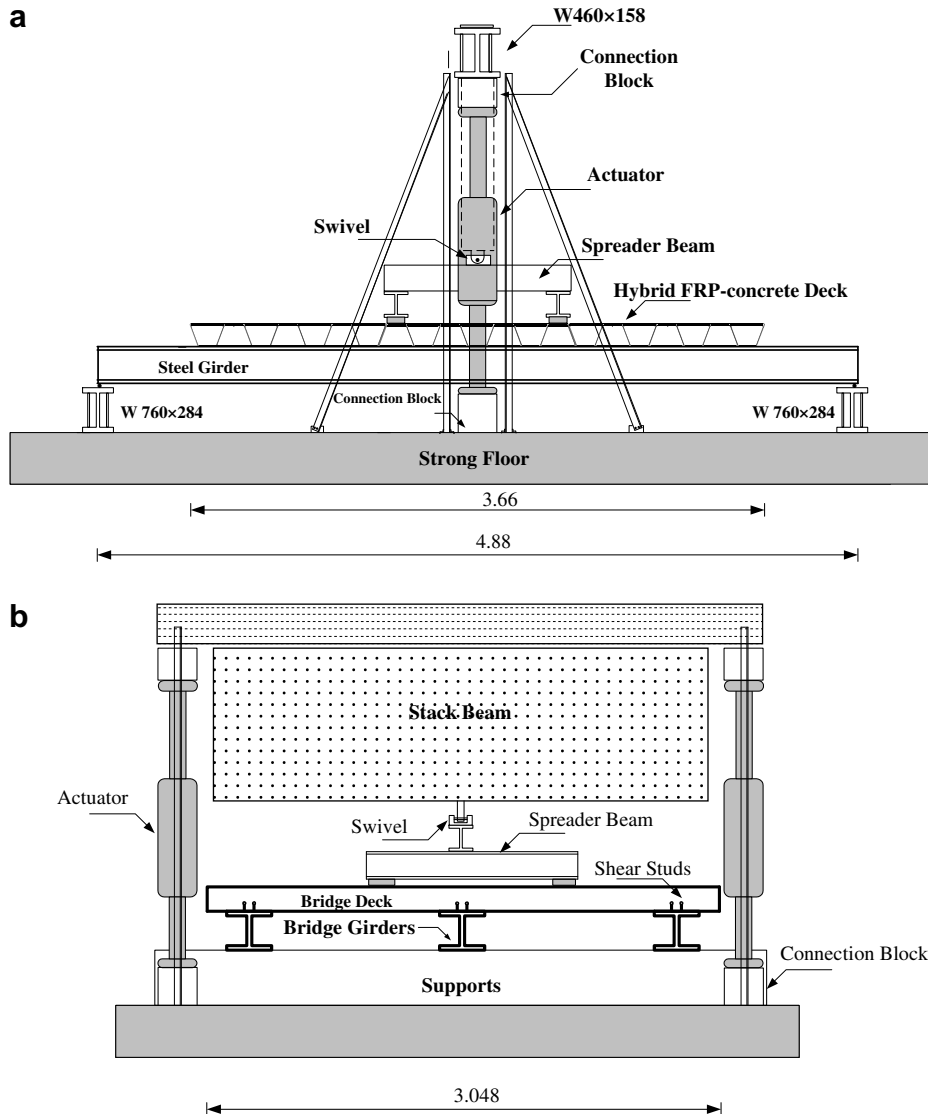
Test configuration for service test (dimensions in metres) (a) longitudinal elevation and (b) transverse elevation.
